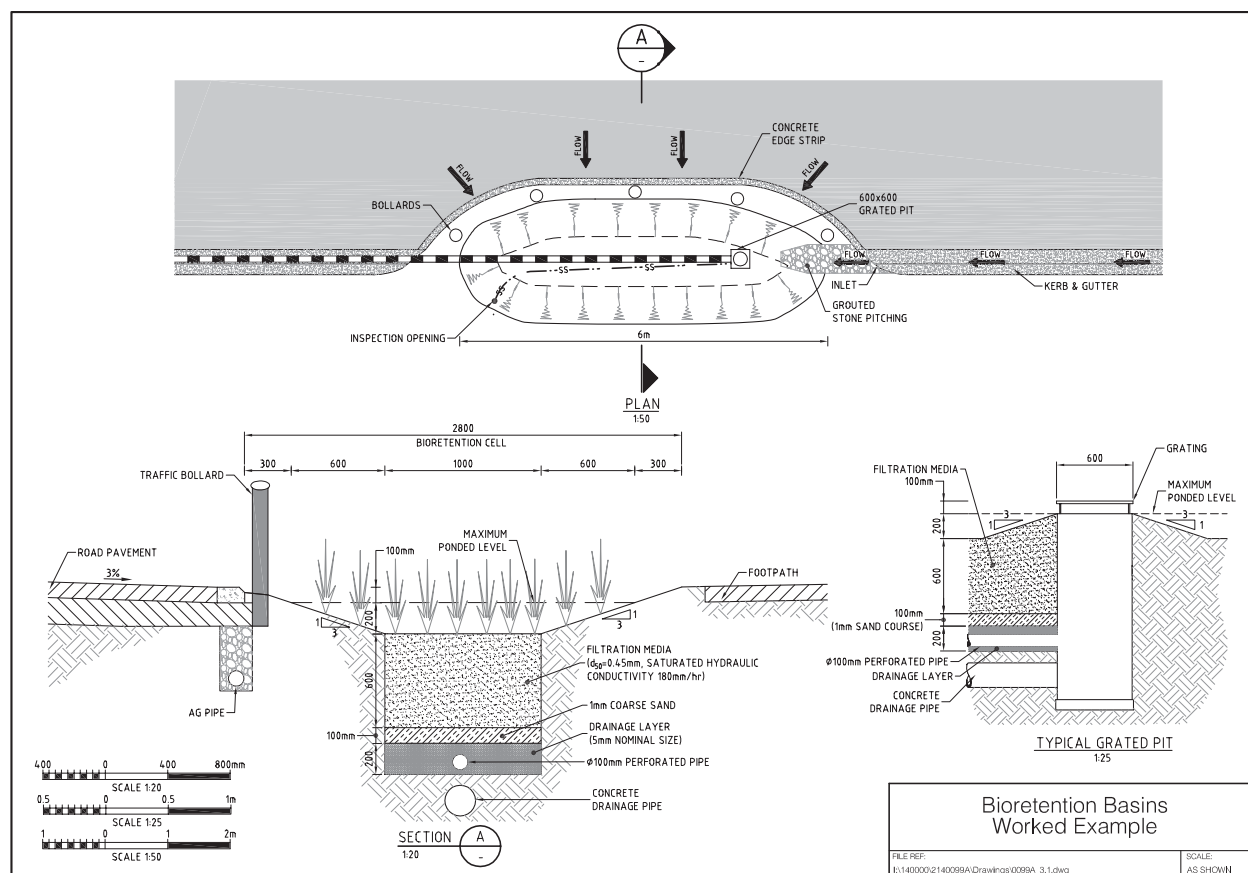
Construction drawing and a section view of the bioretention basin.
